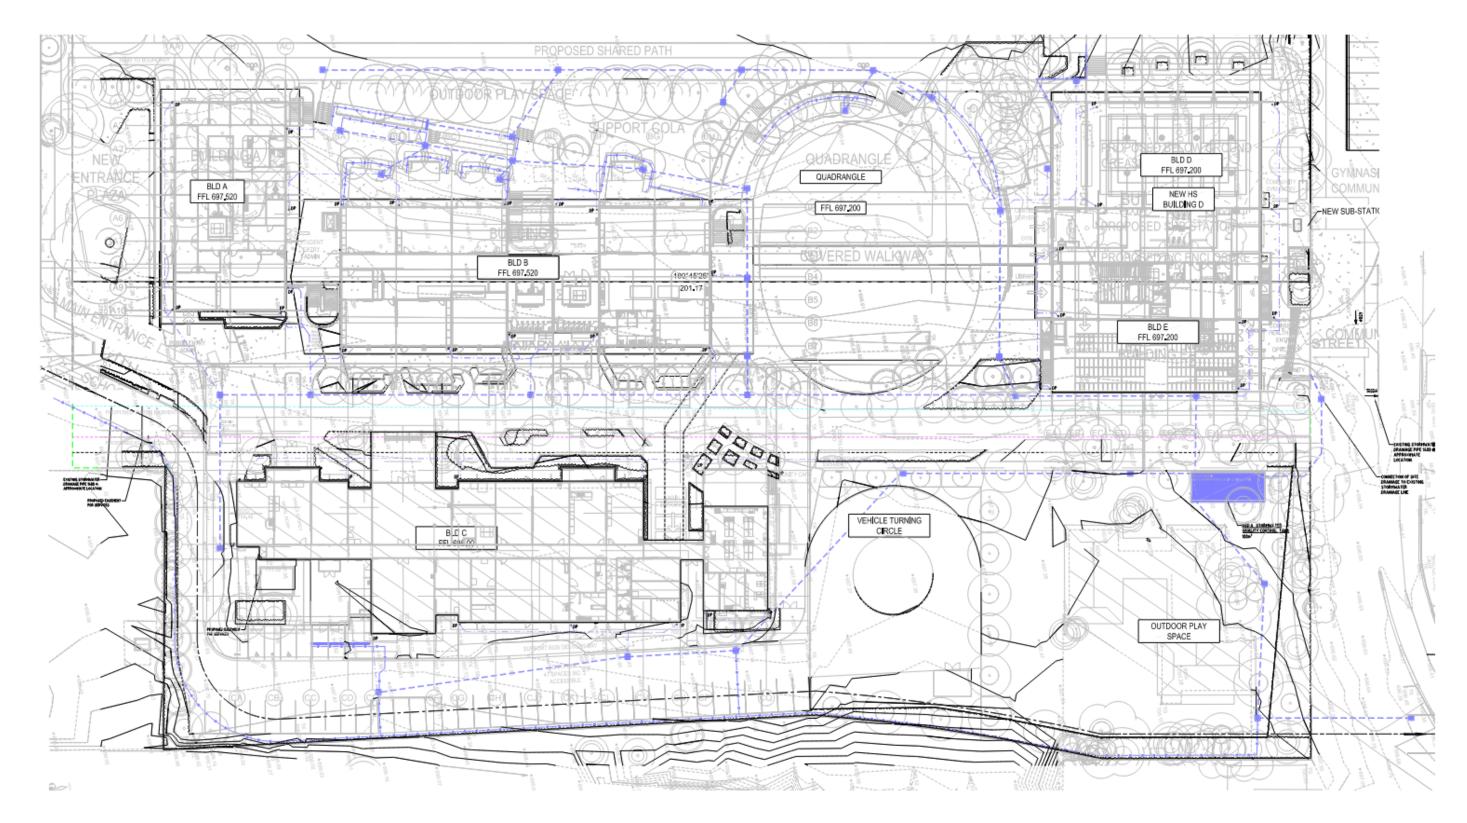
High School Site Stormwater Drainage Plan - REFER APPENDIX B FOR FULL DRAWING(S)
